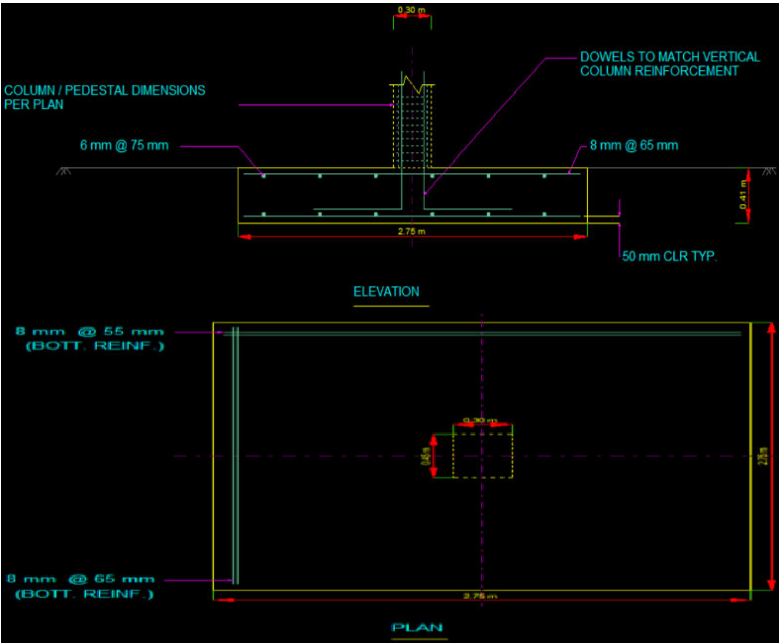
Footing Reinforcement details in Seismic Zone-IV
